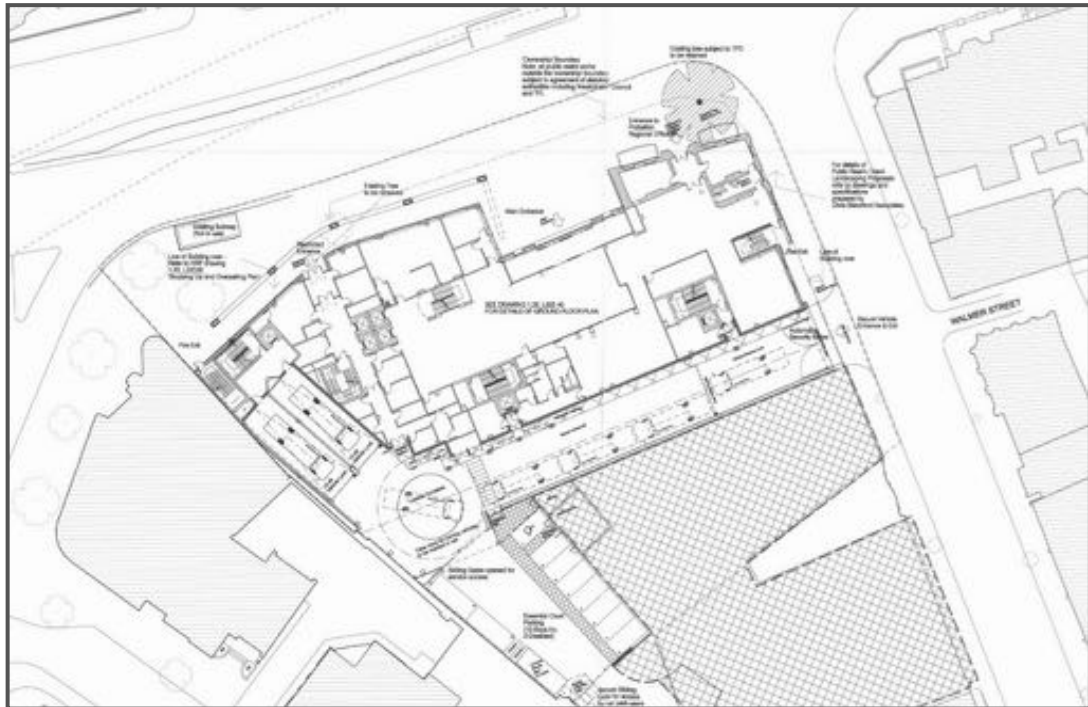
Proposed revised site plan – City of Westminster Magistrates Court (WCC, TP file). The Seymour Place housing site is shown hatched, with the white space of the 'Wigmakers House', 173 Seymour Place, still showing as retained.
